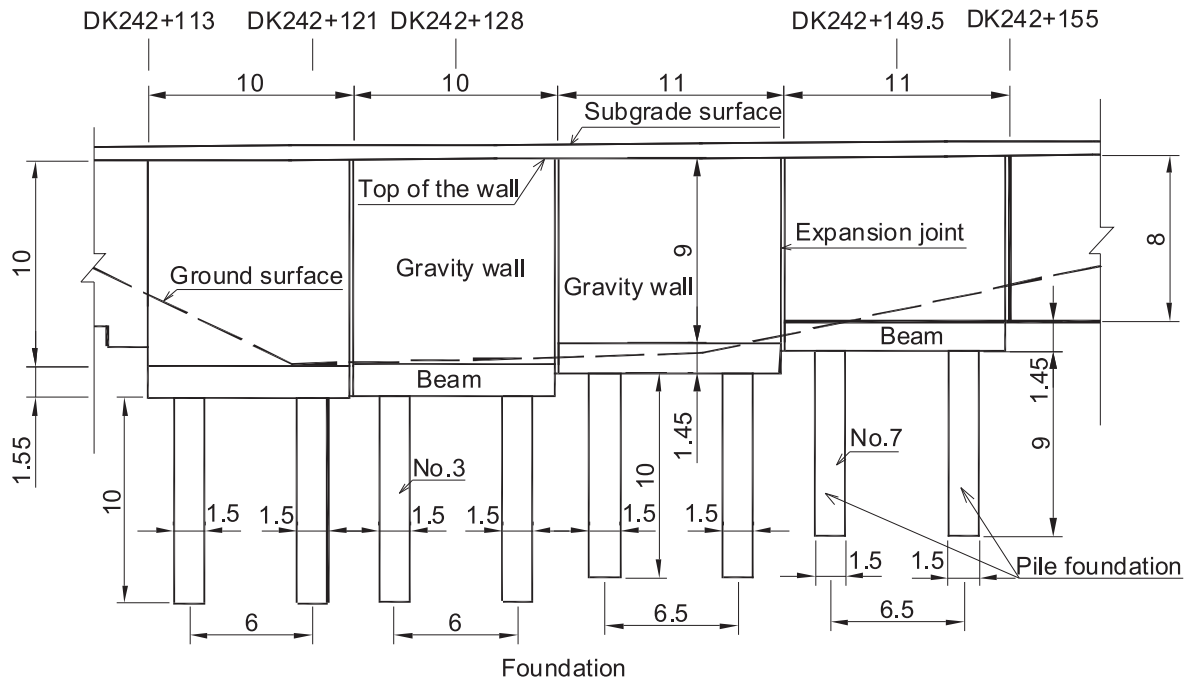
Front view of the piled gravity retaining wall (all units in meters).
